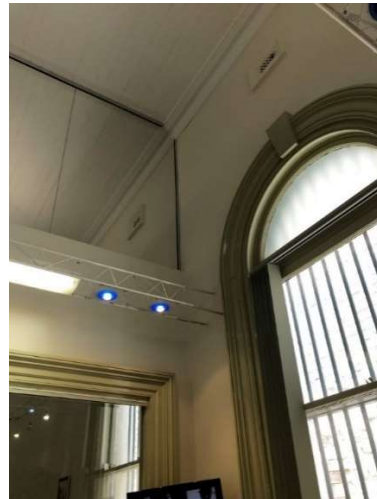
View looking up at early ceiling, noting early windows within the front office space.
